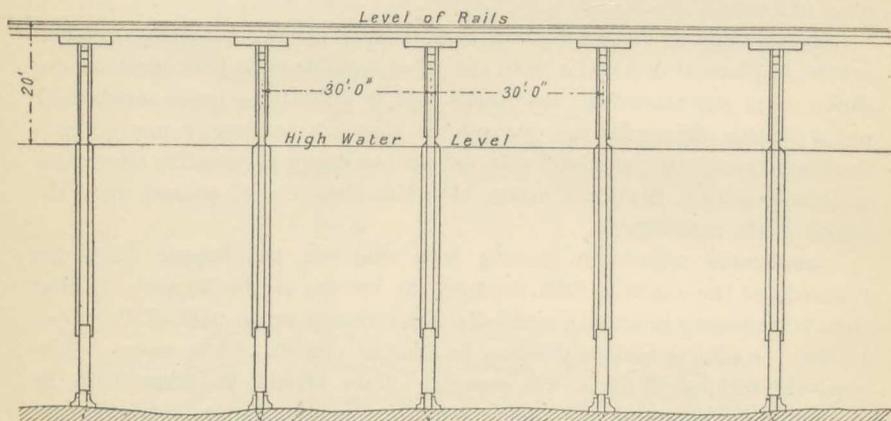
Longitudinal Elevation of Staging, Holyhead Breakwater.
